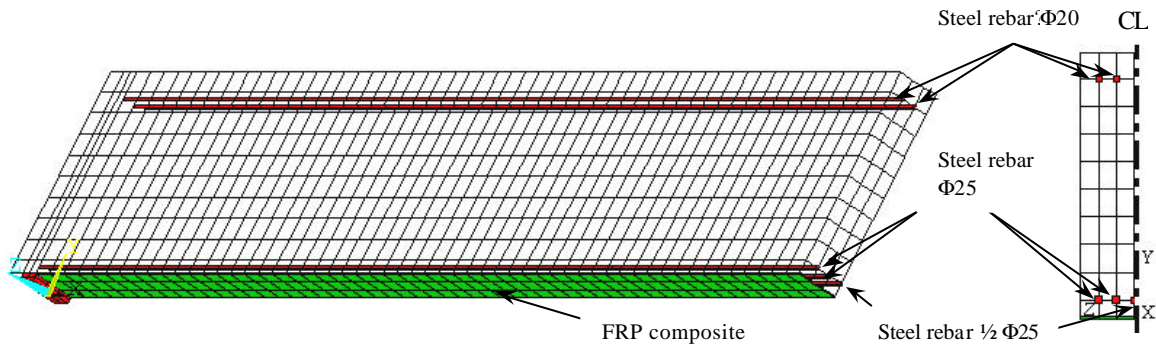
Finite element model of the reinforced concrete beam strengthened with FRP laminate
